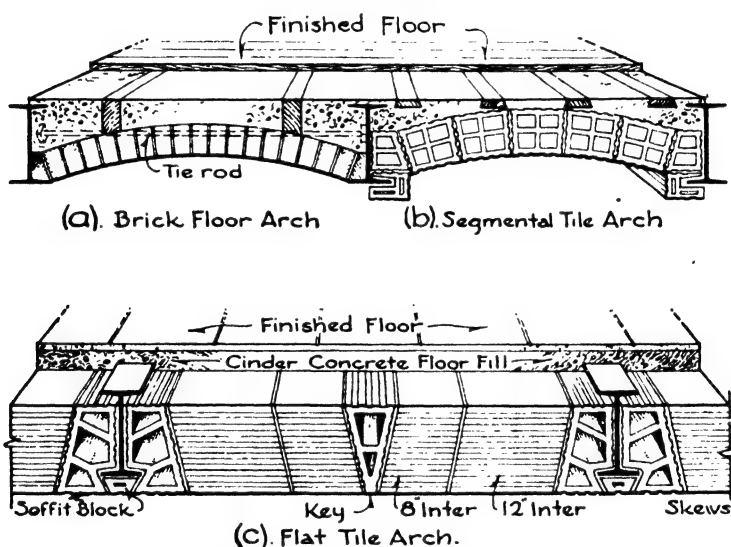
Early Forms of Brick and Tile Floor Arches.
